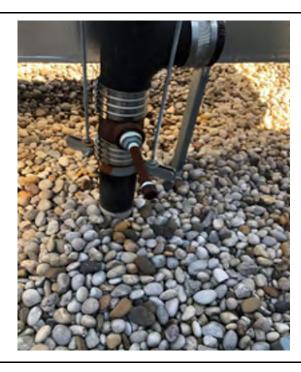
V1 riser and sample port in good condition, facing east. 8 April 2021.
